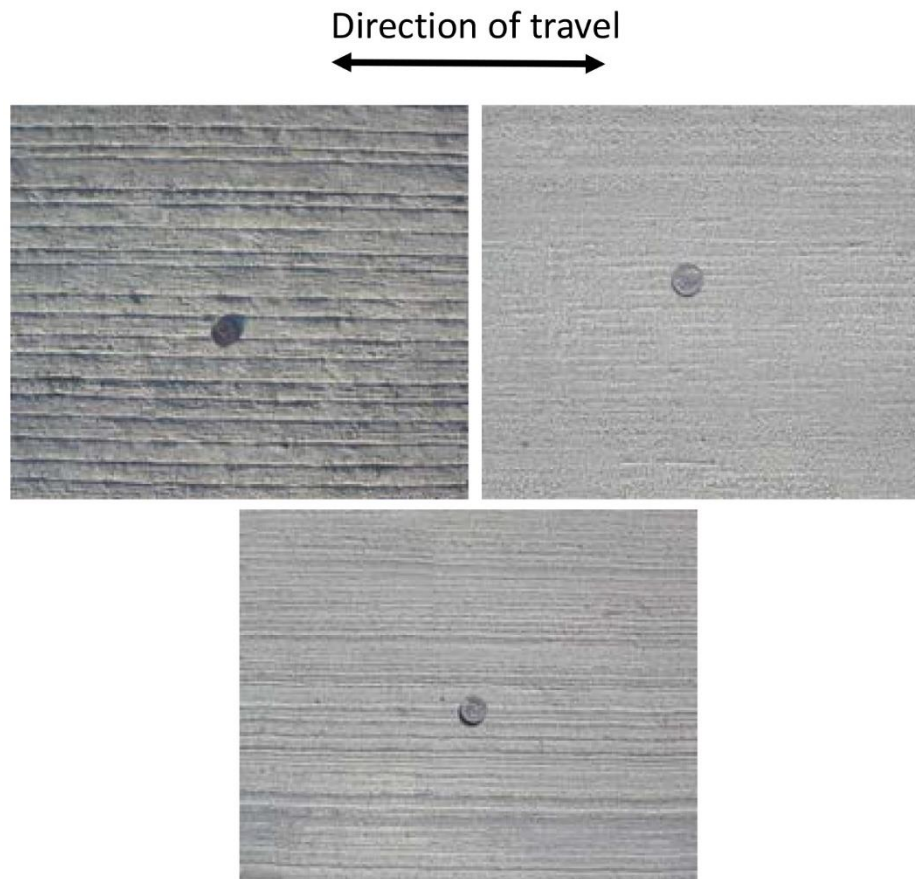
SR 58 Bypass rigid pavement baseline test section textures
